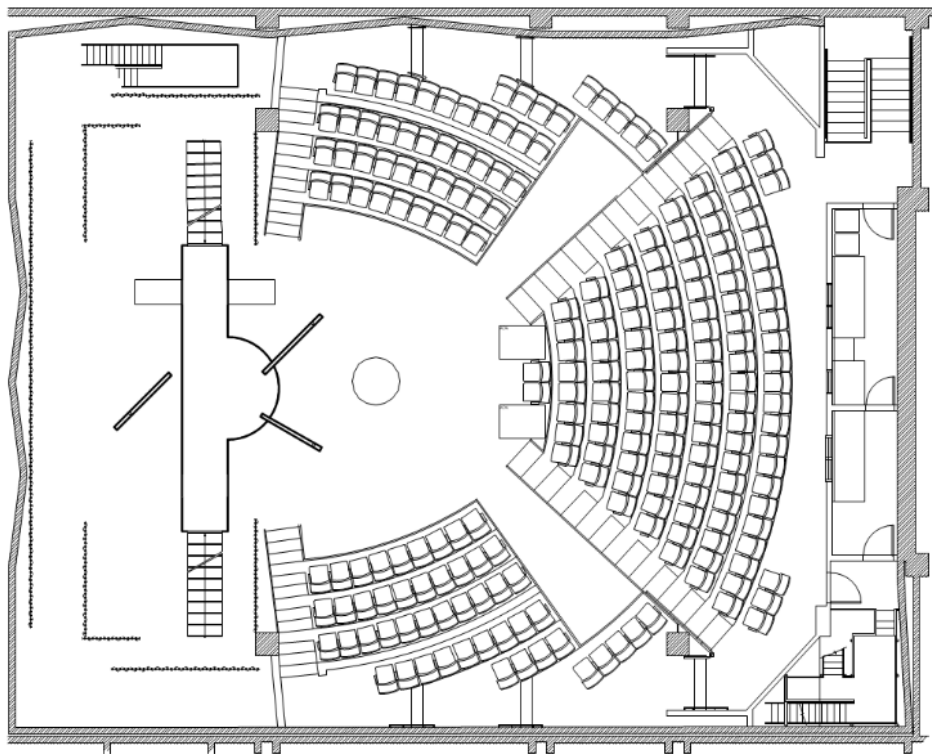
Final Redesign Ground Plan with 2 Ladder Placement
